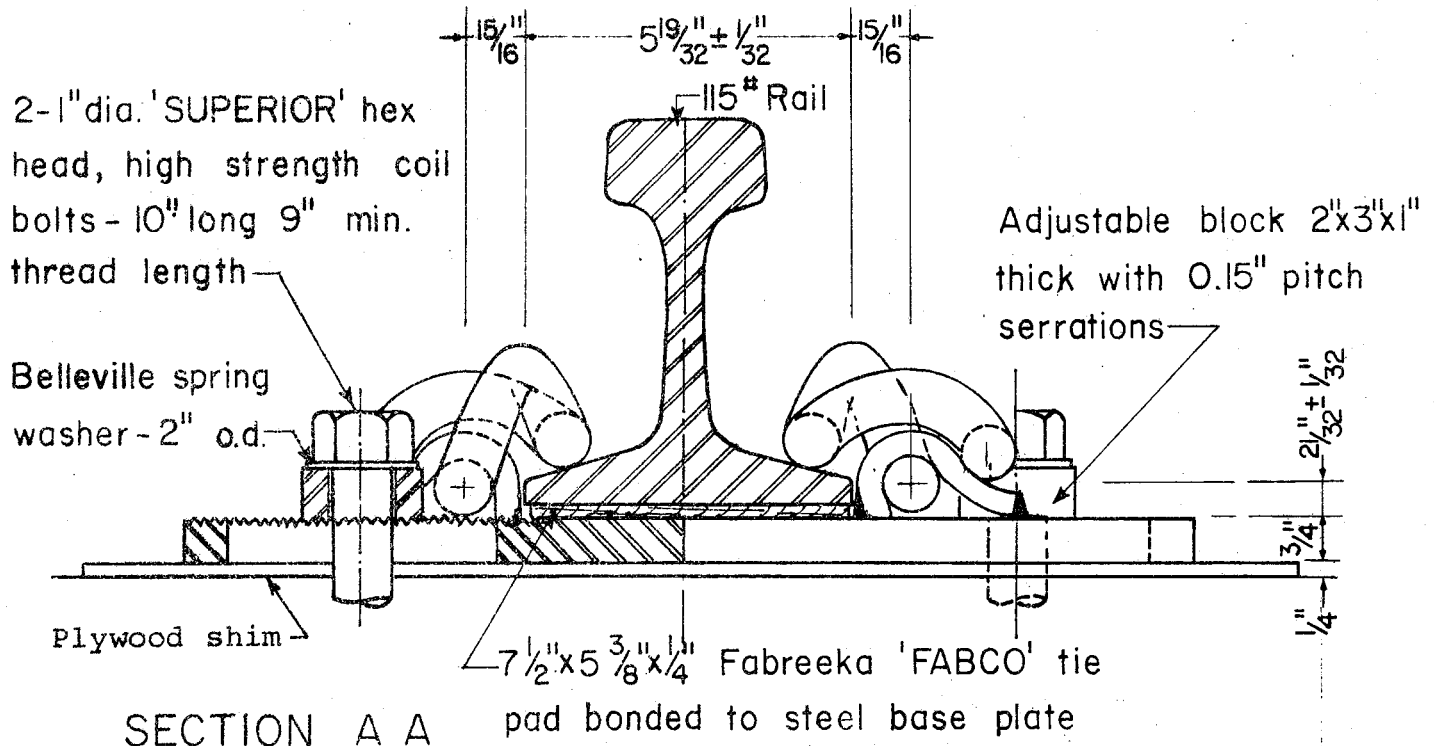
GERWICK RT-7S CONCRETE TIE
